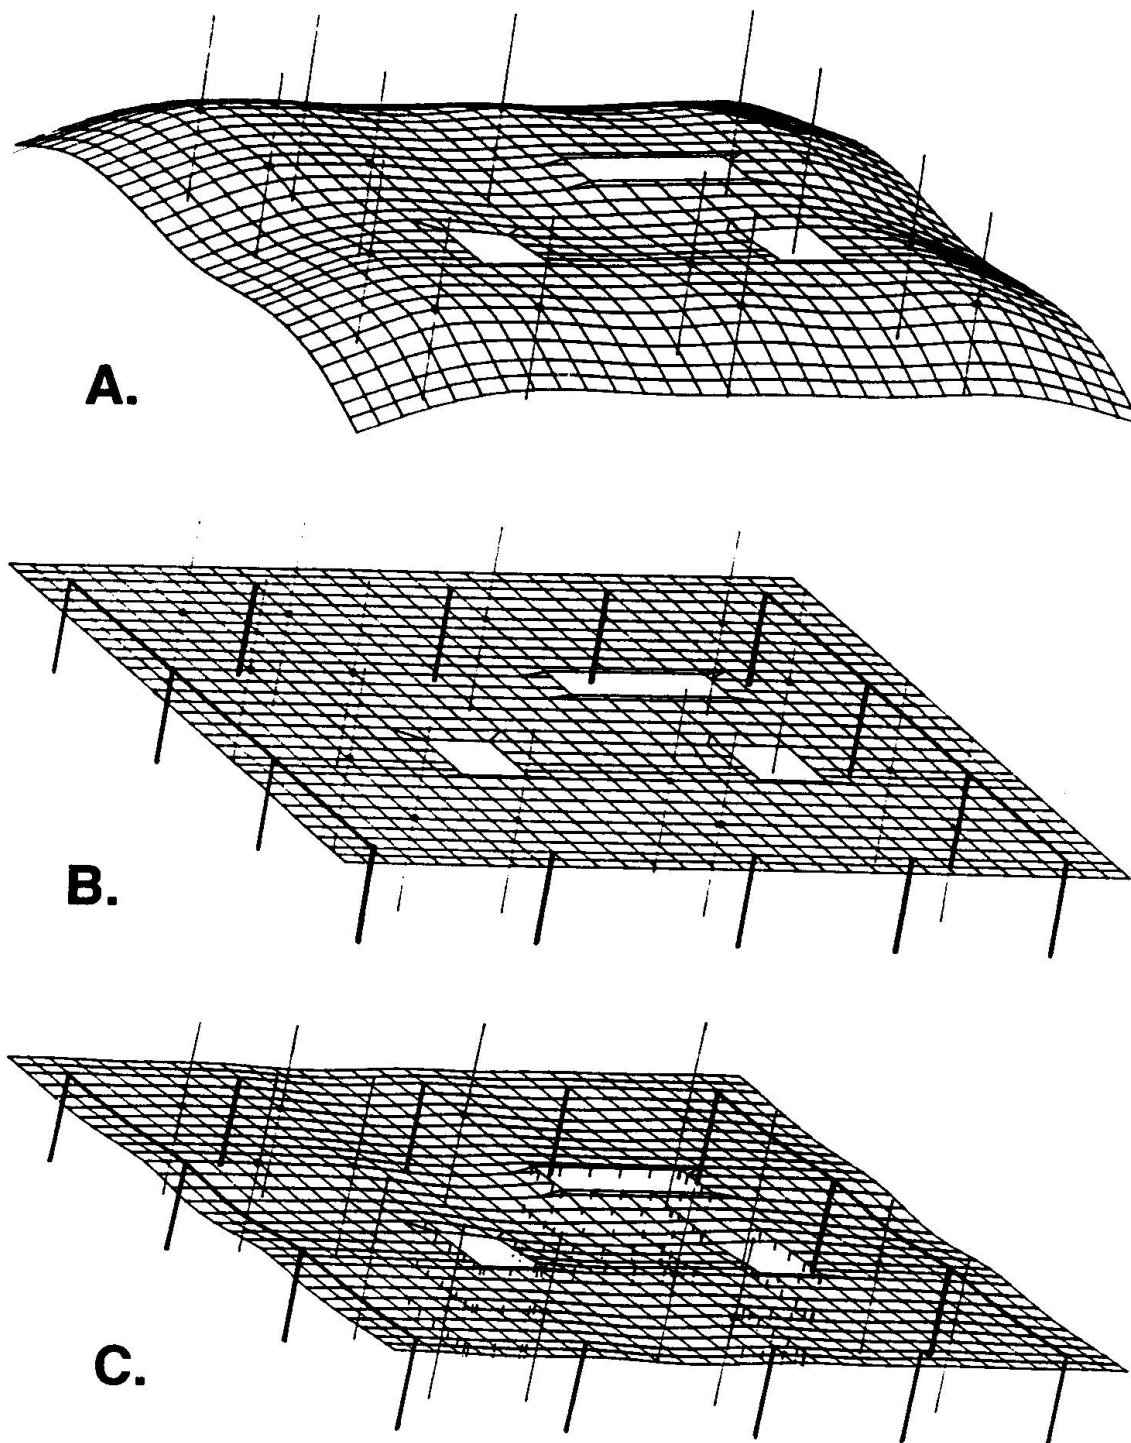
Finite element models of fifth floor two way posttensioned slab system:
